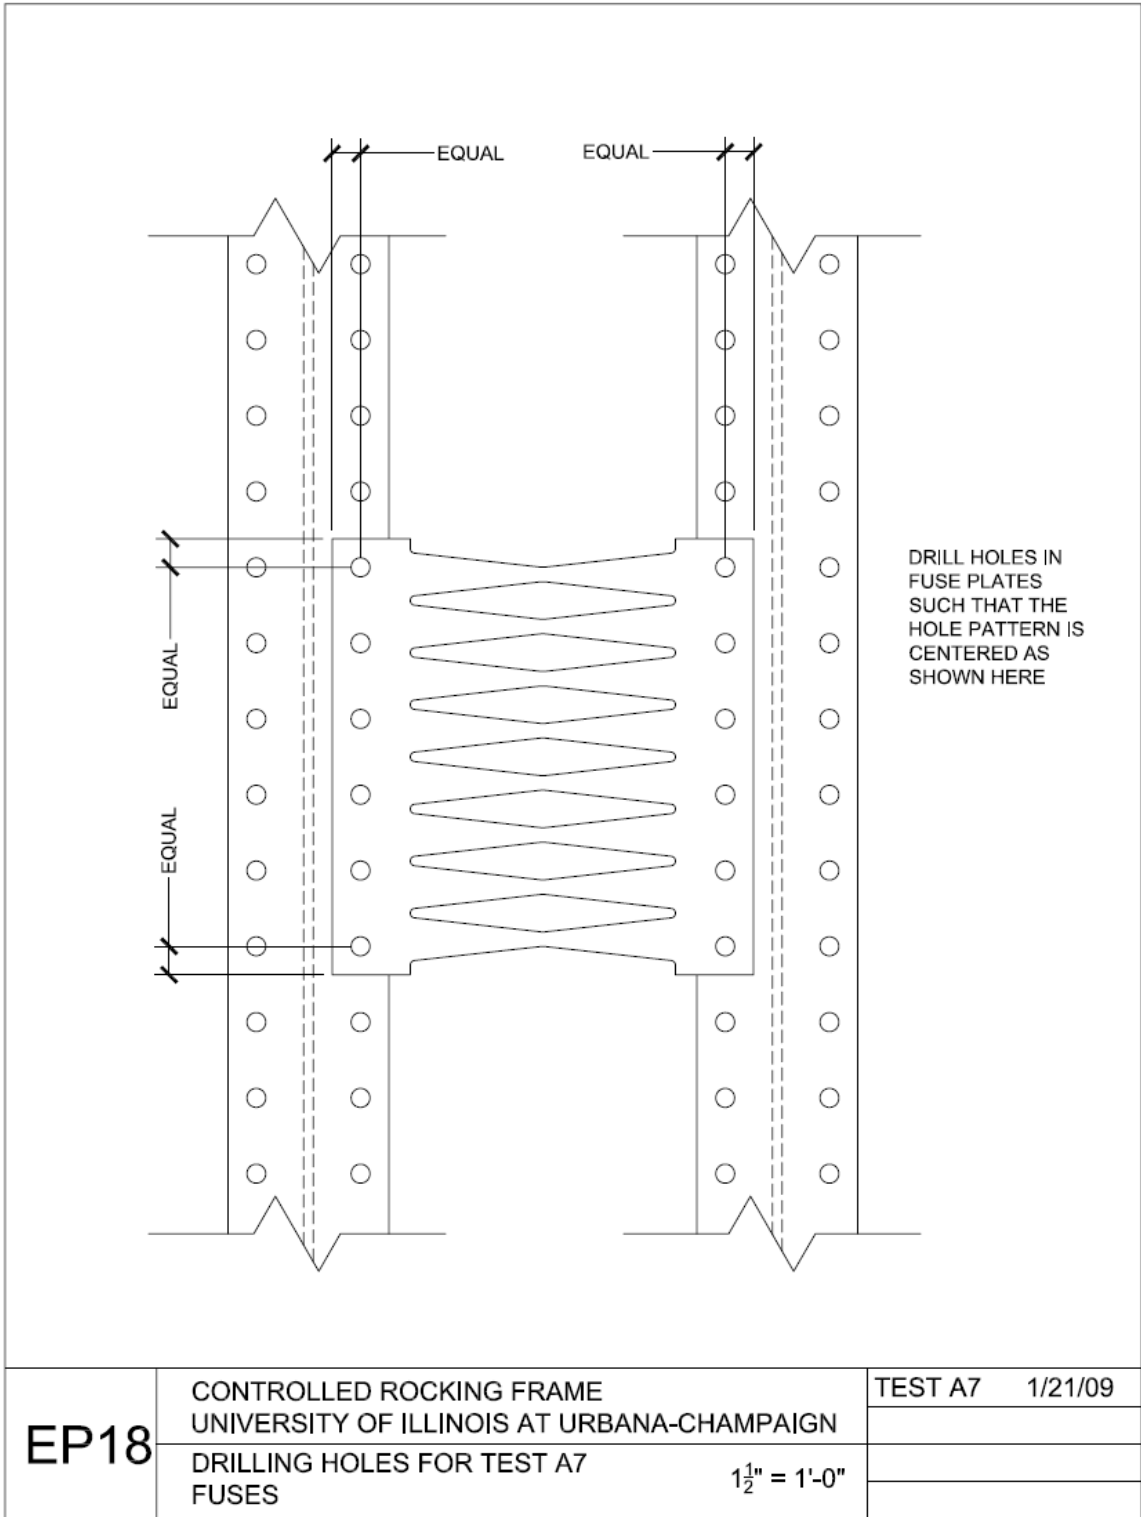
Erection Plan Drawing for Specimen A7 Fuse
